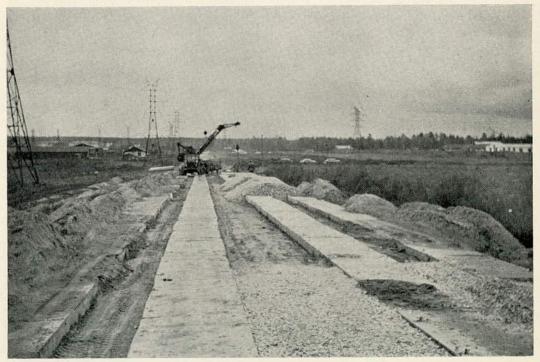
Construction of experimental road. Pavement for four wheel tracks has been precast.
